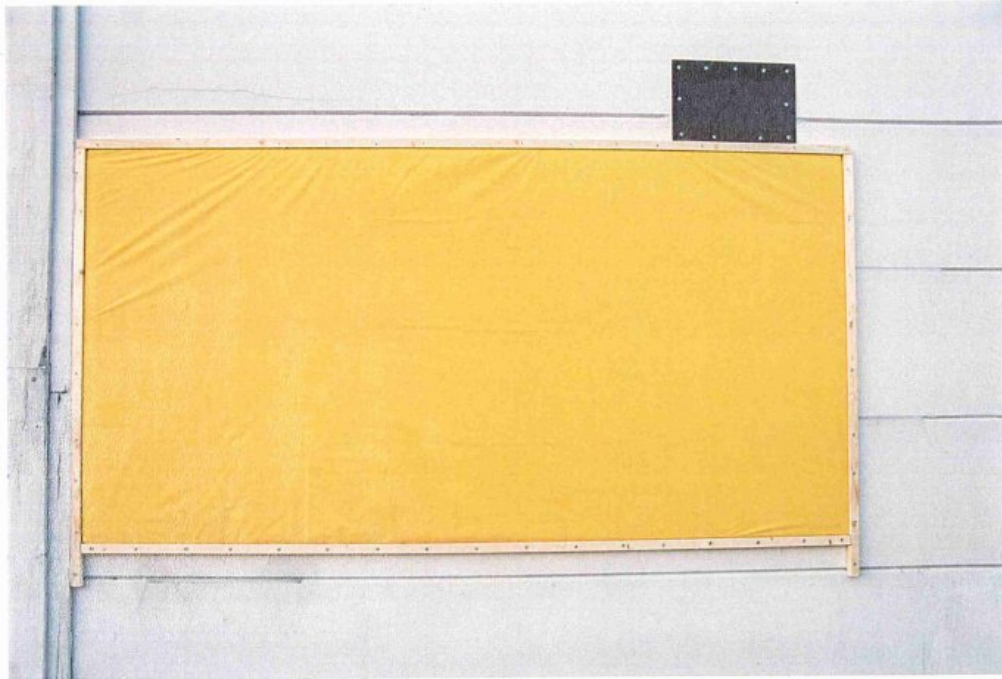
The GoreTex cloth mounted on the exterior side of the concrete wall. The solar shading device is not yet in place.
